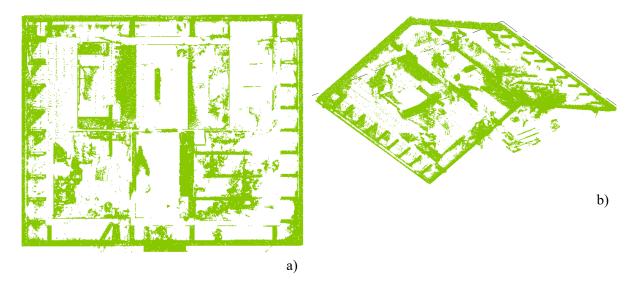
The timber structure was classified with different views: a)Floor plan view, b) 3D view
